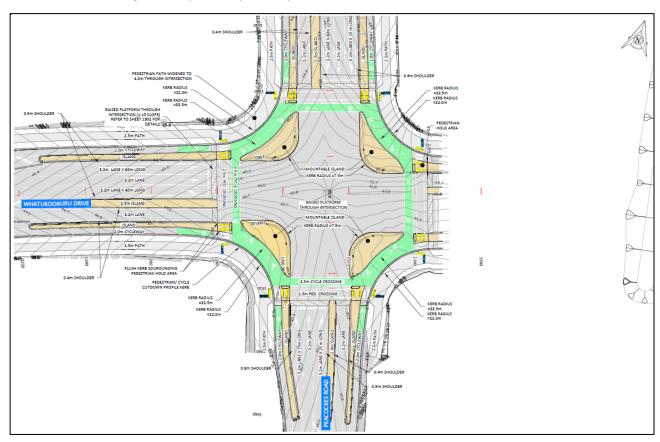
Peacockes Road/ Whatukooruru Drive Intersection Geometric Layout
